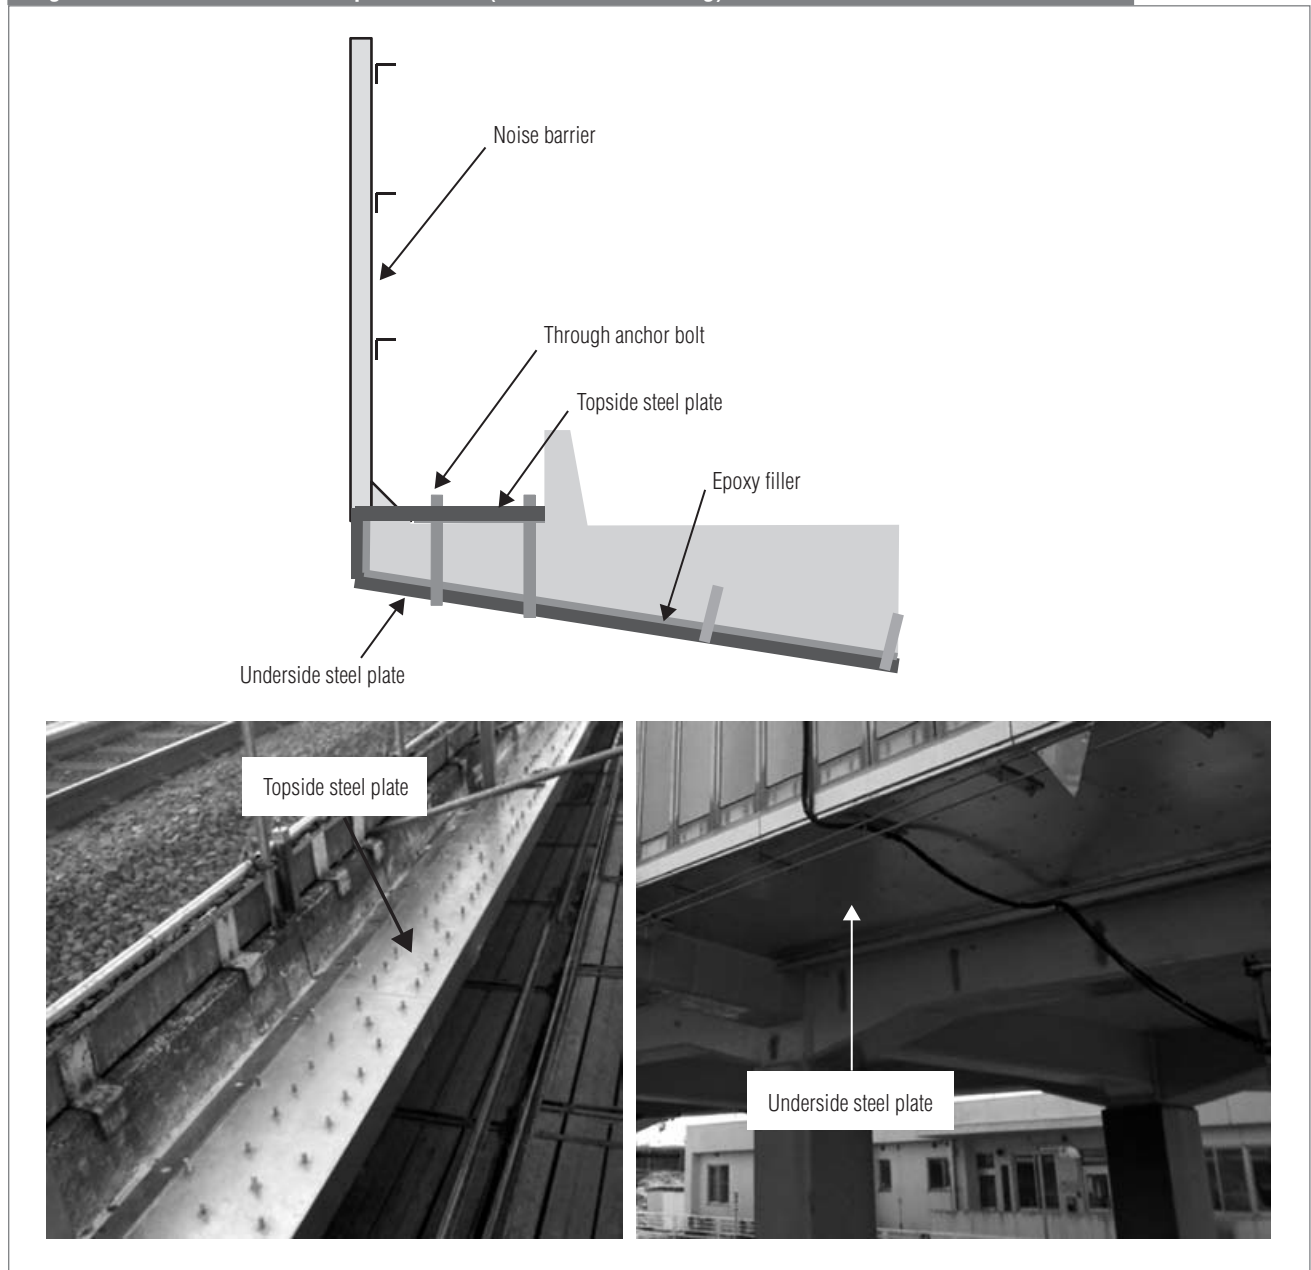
Overview of New Repair Method (Steel-Plate Cladding) for Full Cross-Section of Structures
